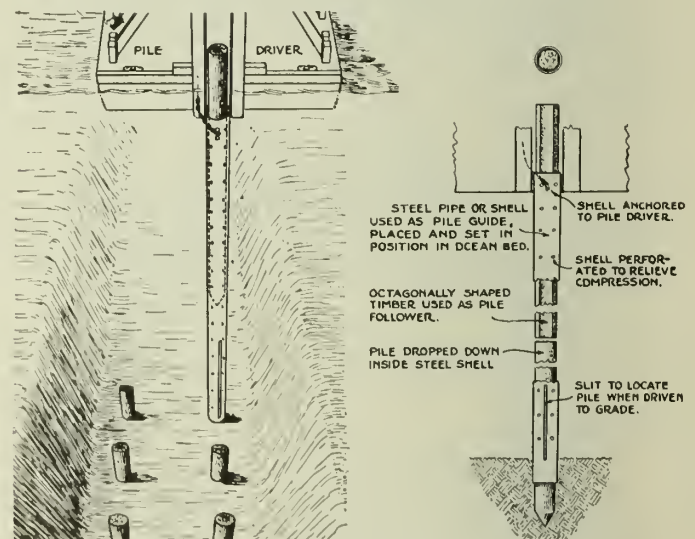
Steel Shell used in Driving Short Piles on Outfall.
